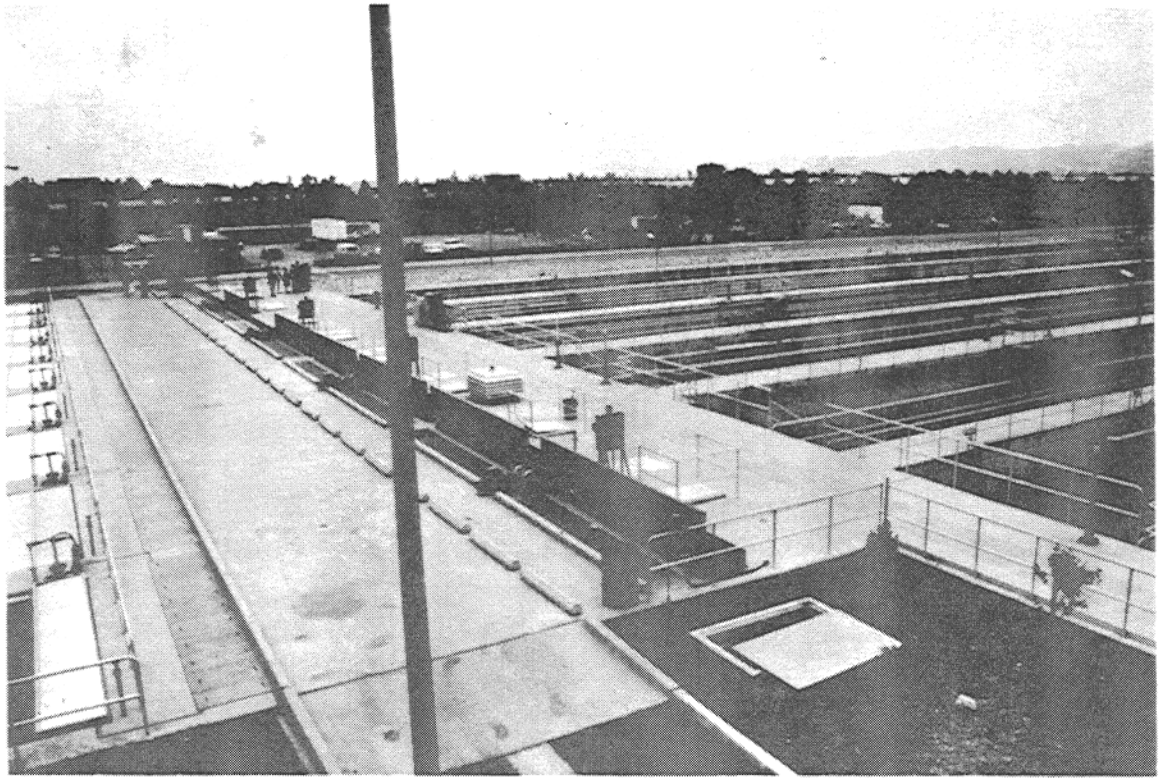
Donald C. Tillman Water Reclamation Plant (view toward northwest from atop plant building, located in northeastern portion of reservoir).
